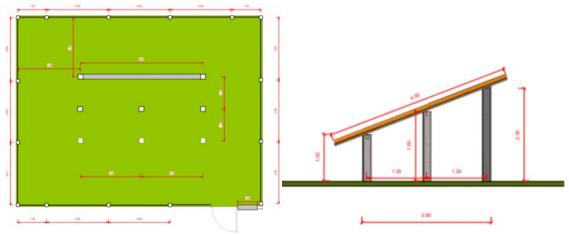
Detailing of roof dimensions didactic, according to ENERGIF criteria
